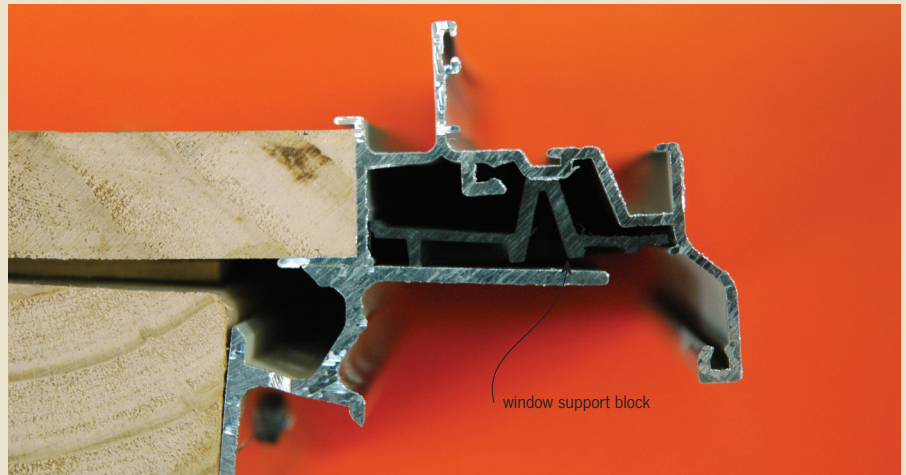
Wanz window sill support bar with support block (black) after extreme testing.
